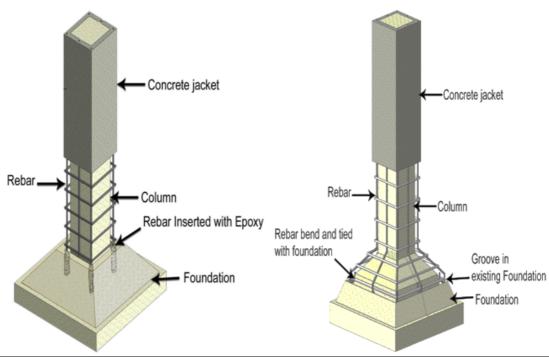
Jacketing of column and foundation (credit: TESRA ppt)
